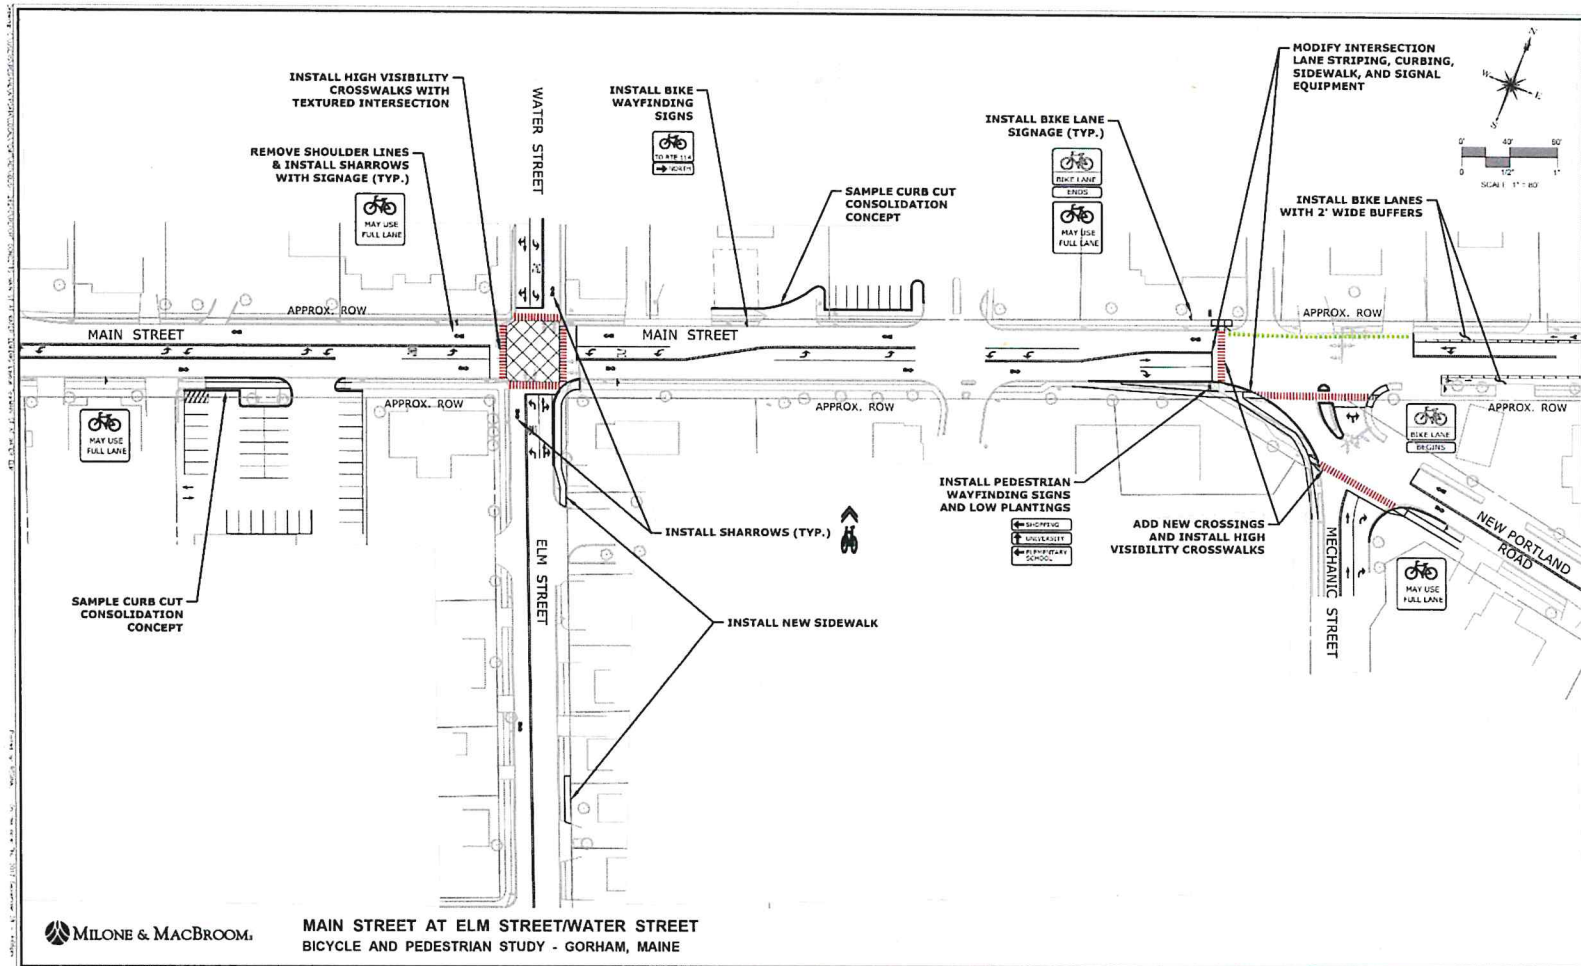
Concept plan showing improvements at along Main Street near Water Street / Elm Street and Main Street and New Portland Road / Mechanic Street.
